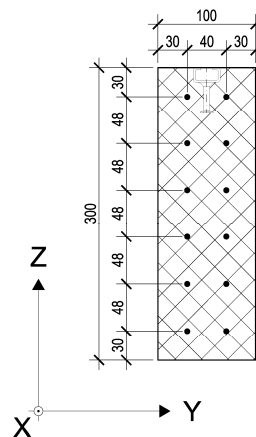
Cross-section of three-storey rectangular HPSCC façade column
